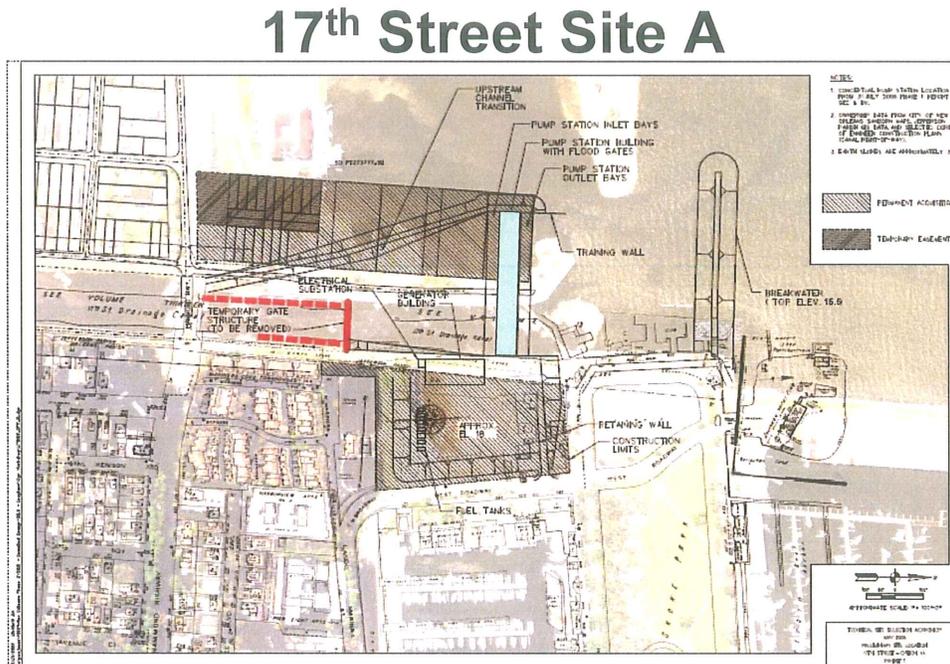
Conceptual plan view of the 17th Street Canal Station and breakwater.
